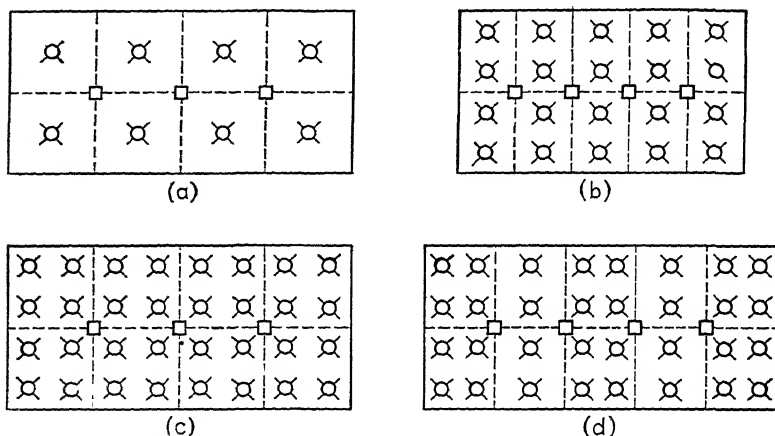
Typical layouts. (a) One unit per bay: satisfactory only where the bay size is no greater than the maximum allowable spacing—an unusual condition except in high-ceilinged rooms. (b) Two units per bay: usually applicable in narrow bays where the width is less than two-thirds the length. (c) Four units per bay: this is the most common arrangement for the square bay of usual dimensions. (d) Four-two system: equivalent to three units per bay. An alternative to four per bay where spacing allows.
